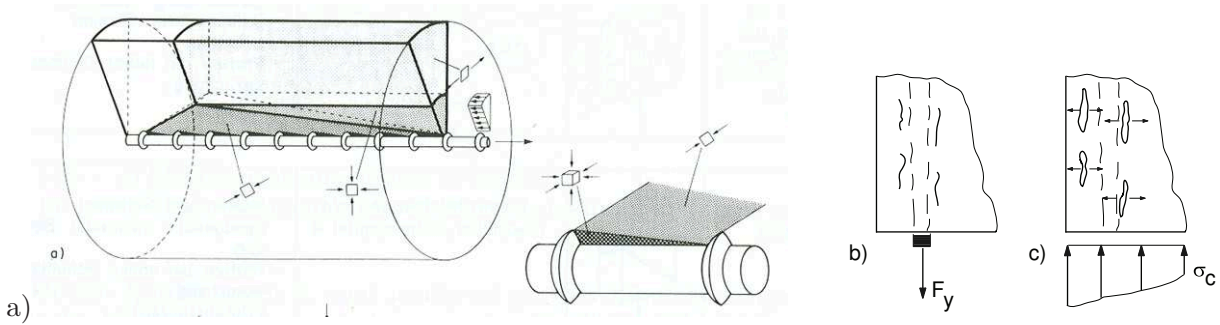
Splitting cracks due to anchoring of rebars, a) stress fields explaining bond mechanism (Muttoni et al. 1996), b) behaviour of splitting cracks in tension, c) in compression cycles.
